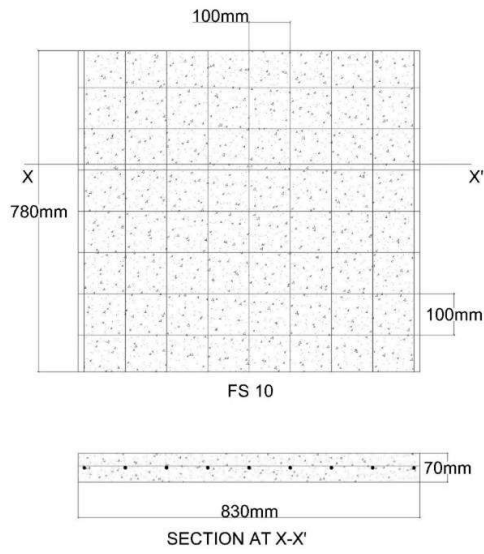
Reinforcement Details of 100 mm spacing specimen
